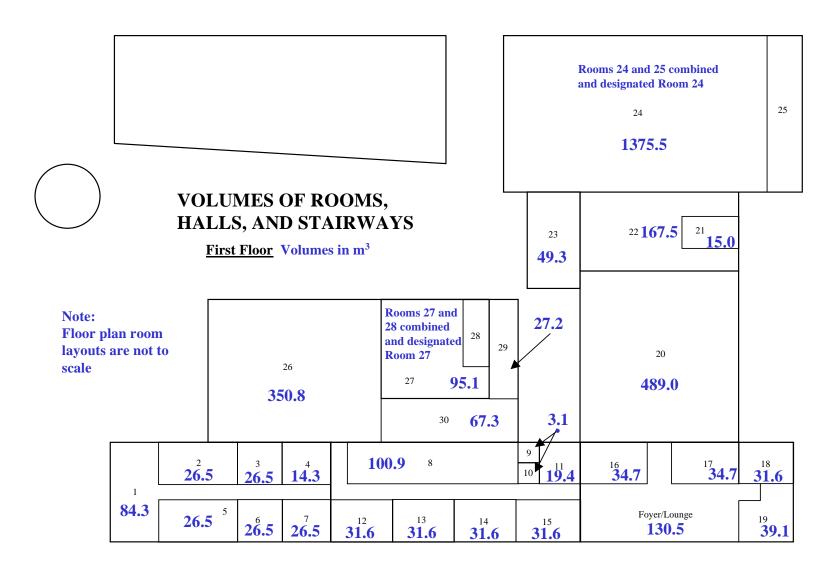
Volumes of Rooms, Halls, and Stairways on the First Floor
